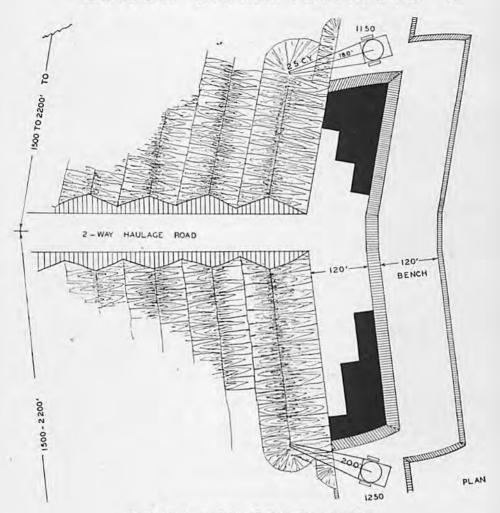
Pit layout-Fairiew Collieries, Harmatten Mine
